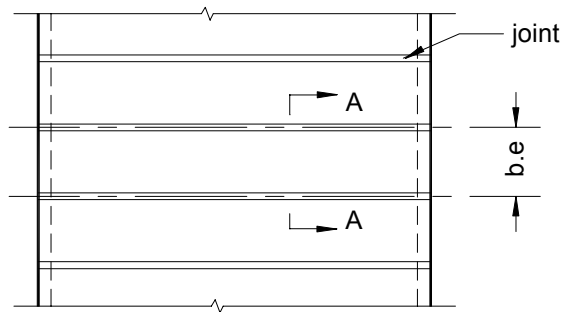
Examples of curved roof kits without additional bearing profiles- single span systems
